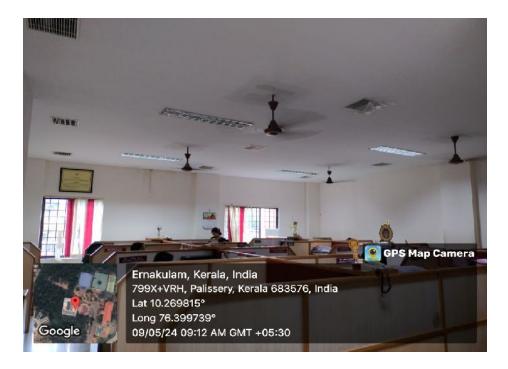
Installing Ceiling Fans in Faculty Rooms
